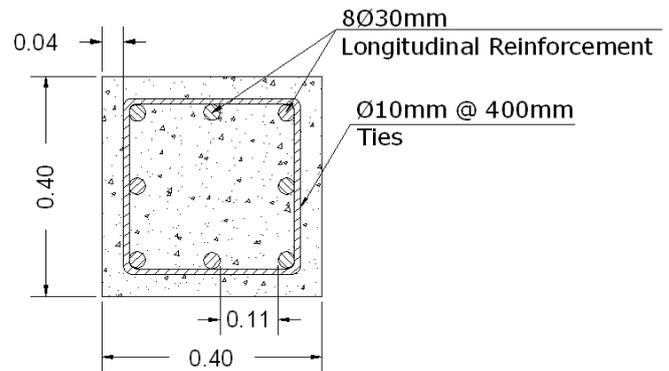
Proposed tied column for Example 9.2-1.
